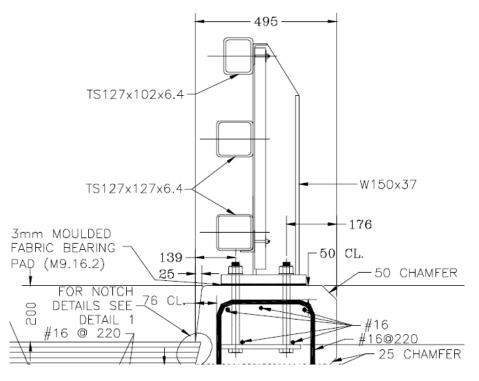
Massachusetts S3-TL4 Bridge Railing [24]
